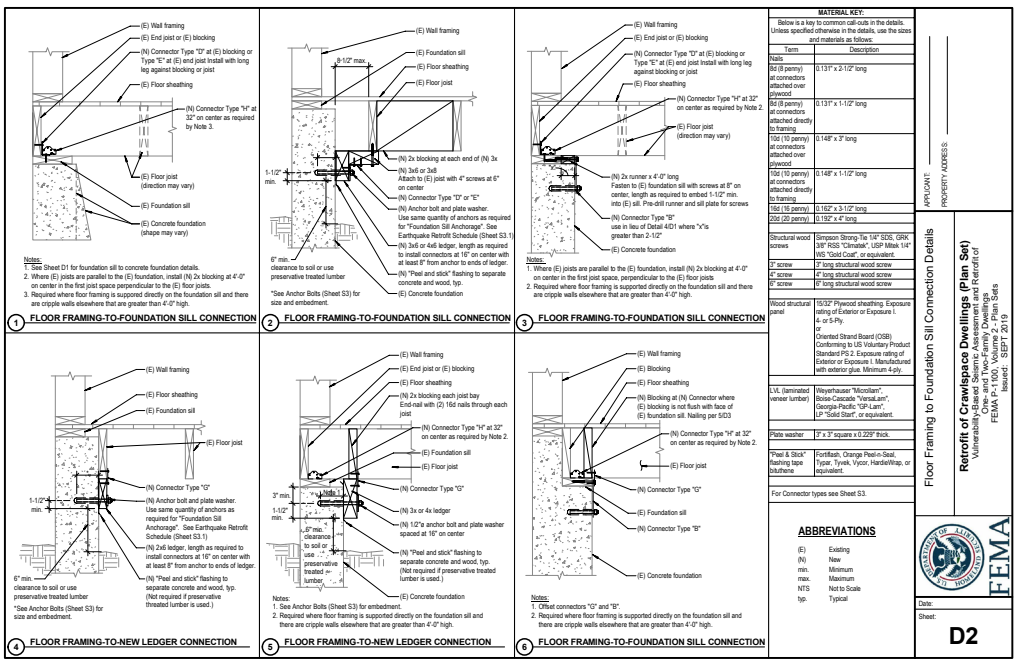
Sheet D2 - Floor Framing to Foundation Sill Connection Details from FEMA P-1100. An example pre-engineered plan for a suggested minimum level of retrofit design for use by a general contractor or homeowner without having to involve a registered design professional.
